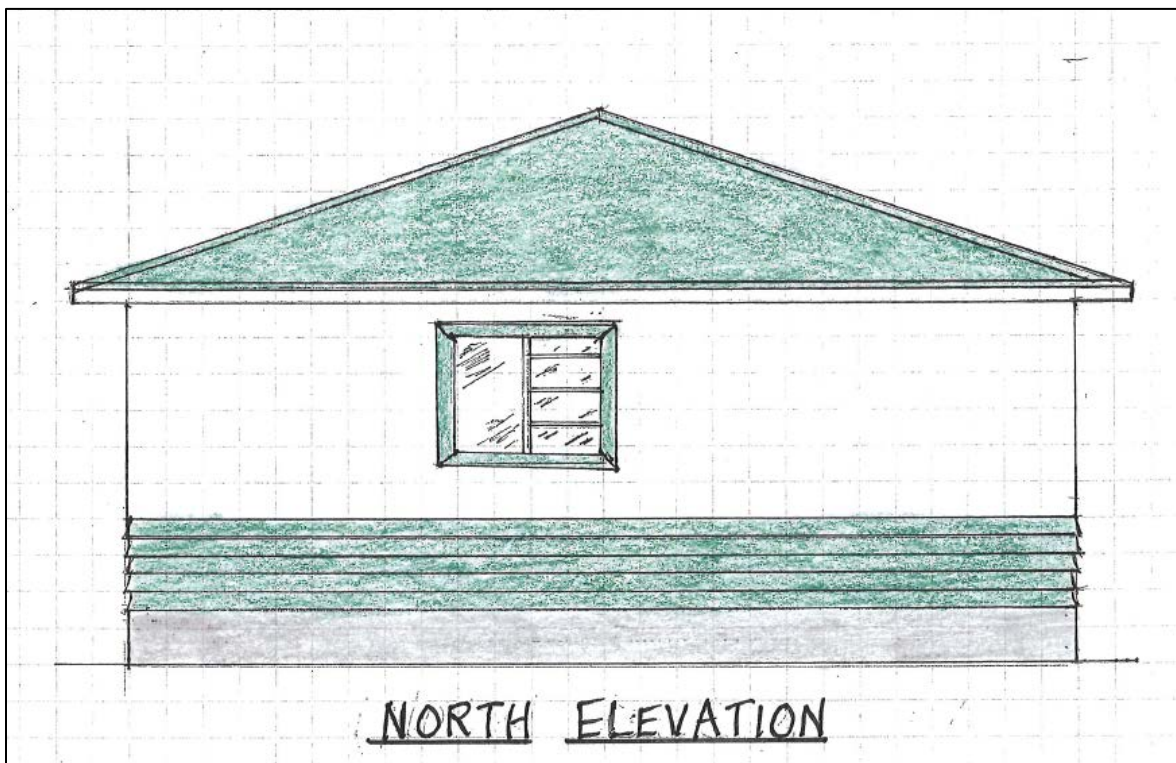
North Elevation of existing dwelling (facing Vernon Avenue)
